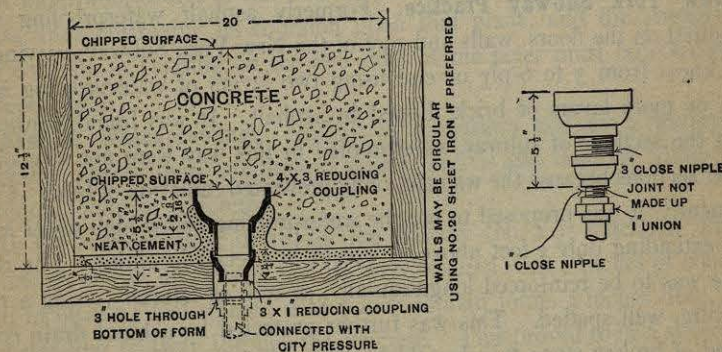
Detail of Specimen for Testing Permeability.* (See p. 348.)
